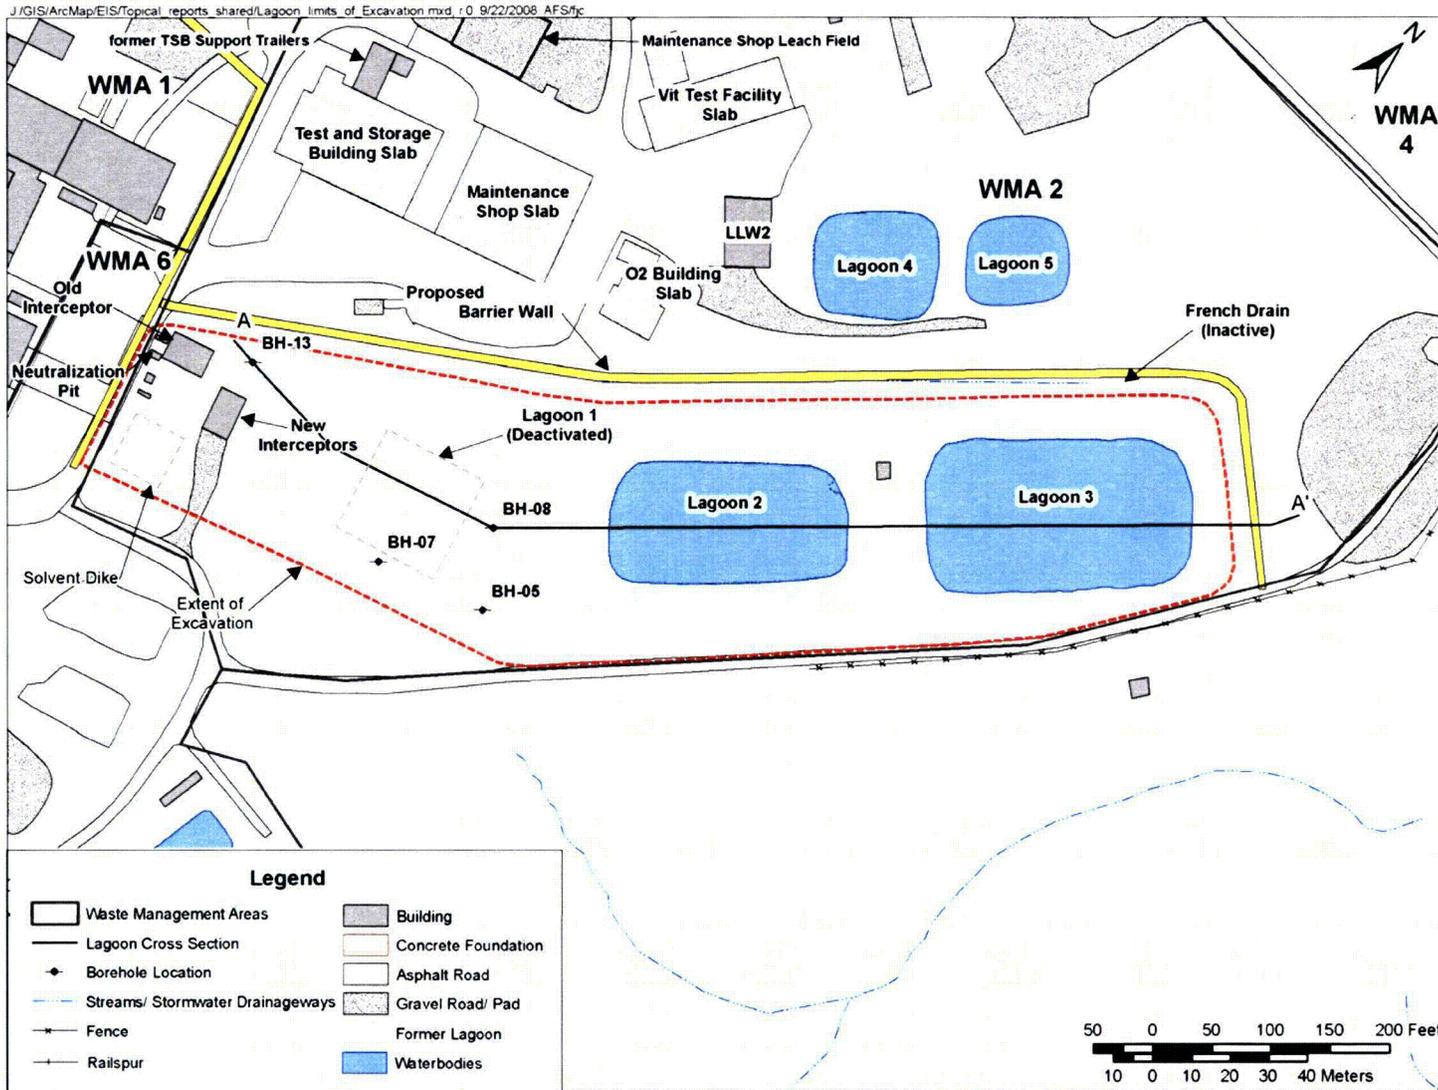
Conceptual Arrangement of WMA 2 Excavation, Plan View
